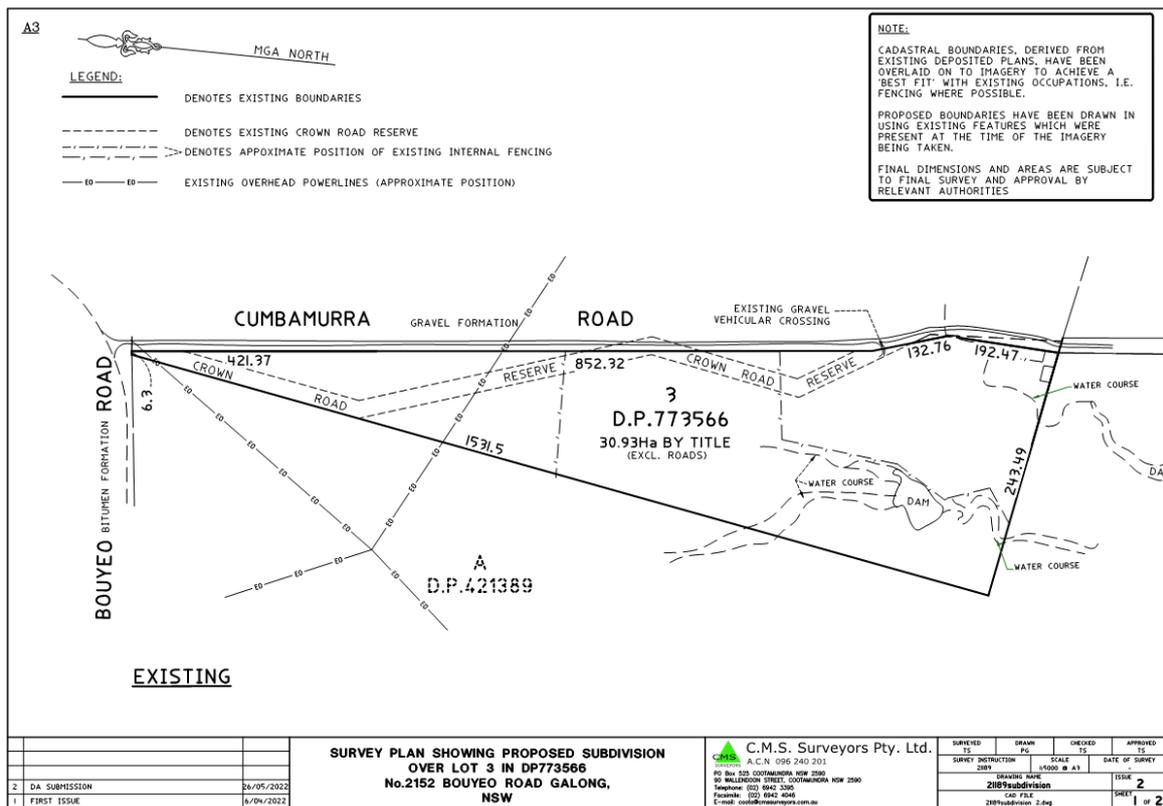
Existing site plan of 3 in DP773566 (21189subdivision 2 sheet 1 of 2)
